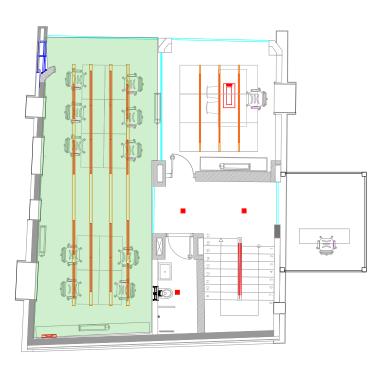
The ERKE Desing Open Office, First Floor Layout
